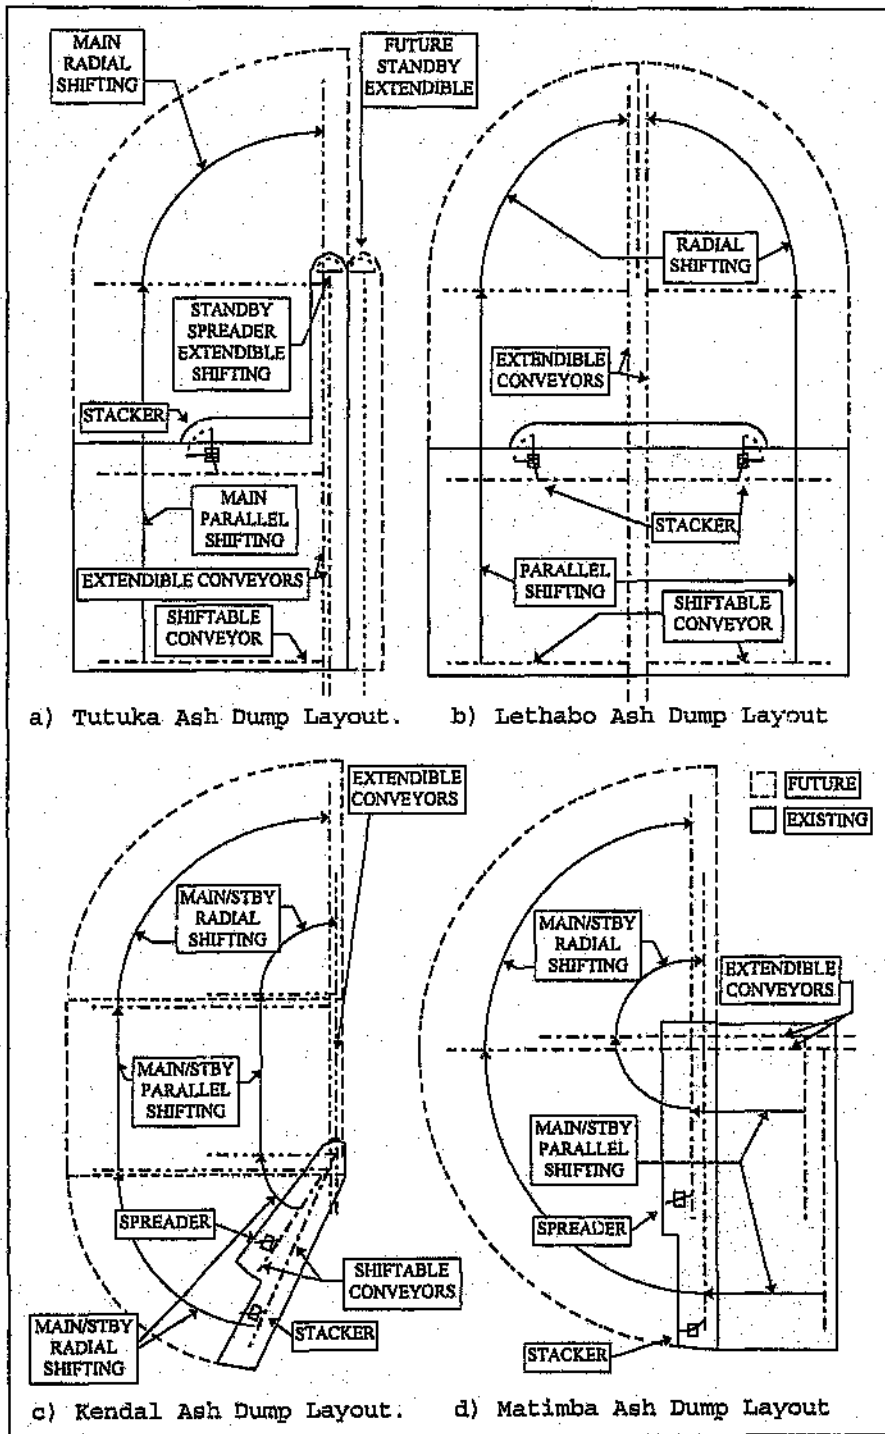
Dry Ash Dump Layout Configurations in Eskom.
